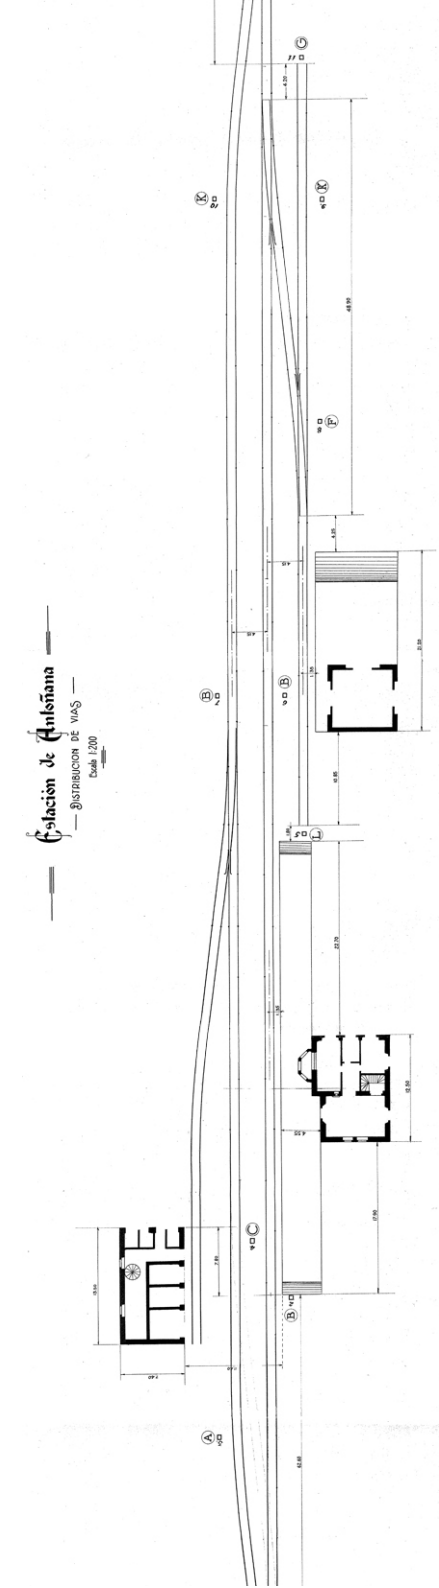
Railway station area of Antoñana composed of loading bay, passenger building and electrical subcentral (left). Alejandro Mendizábal, FEVE's Collection in RMA
